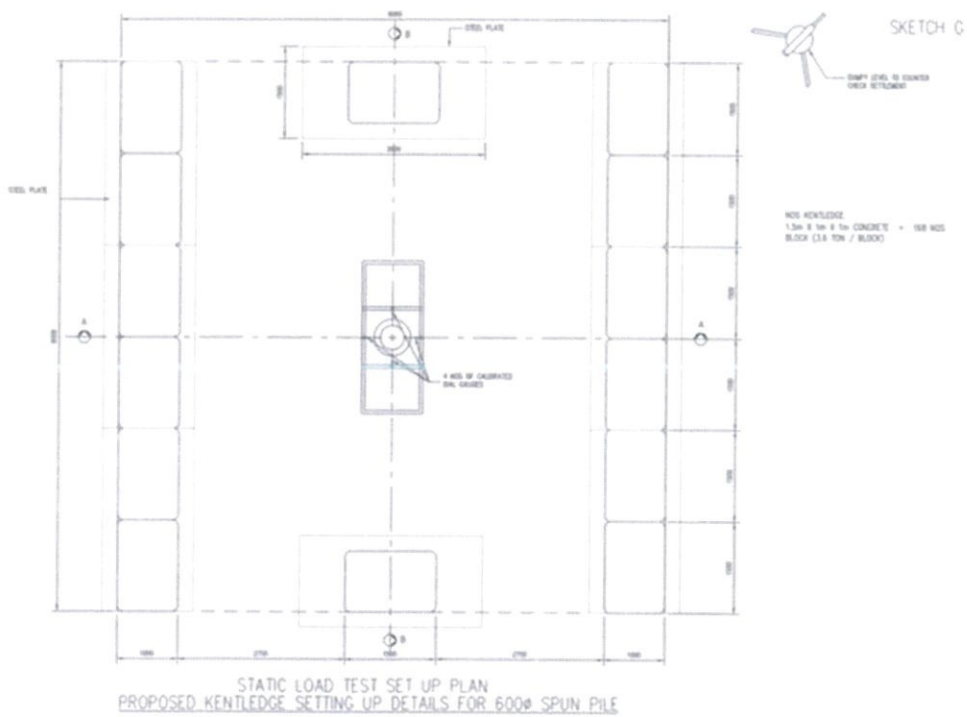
Static Load Test (Maintain) Set Up Plan
